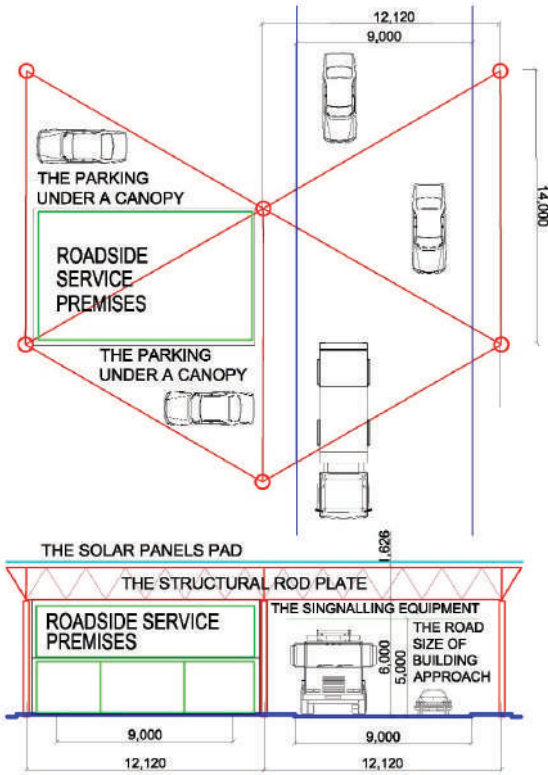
Module parameters: a plan, a section (Dimensions are given in mm).
